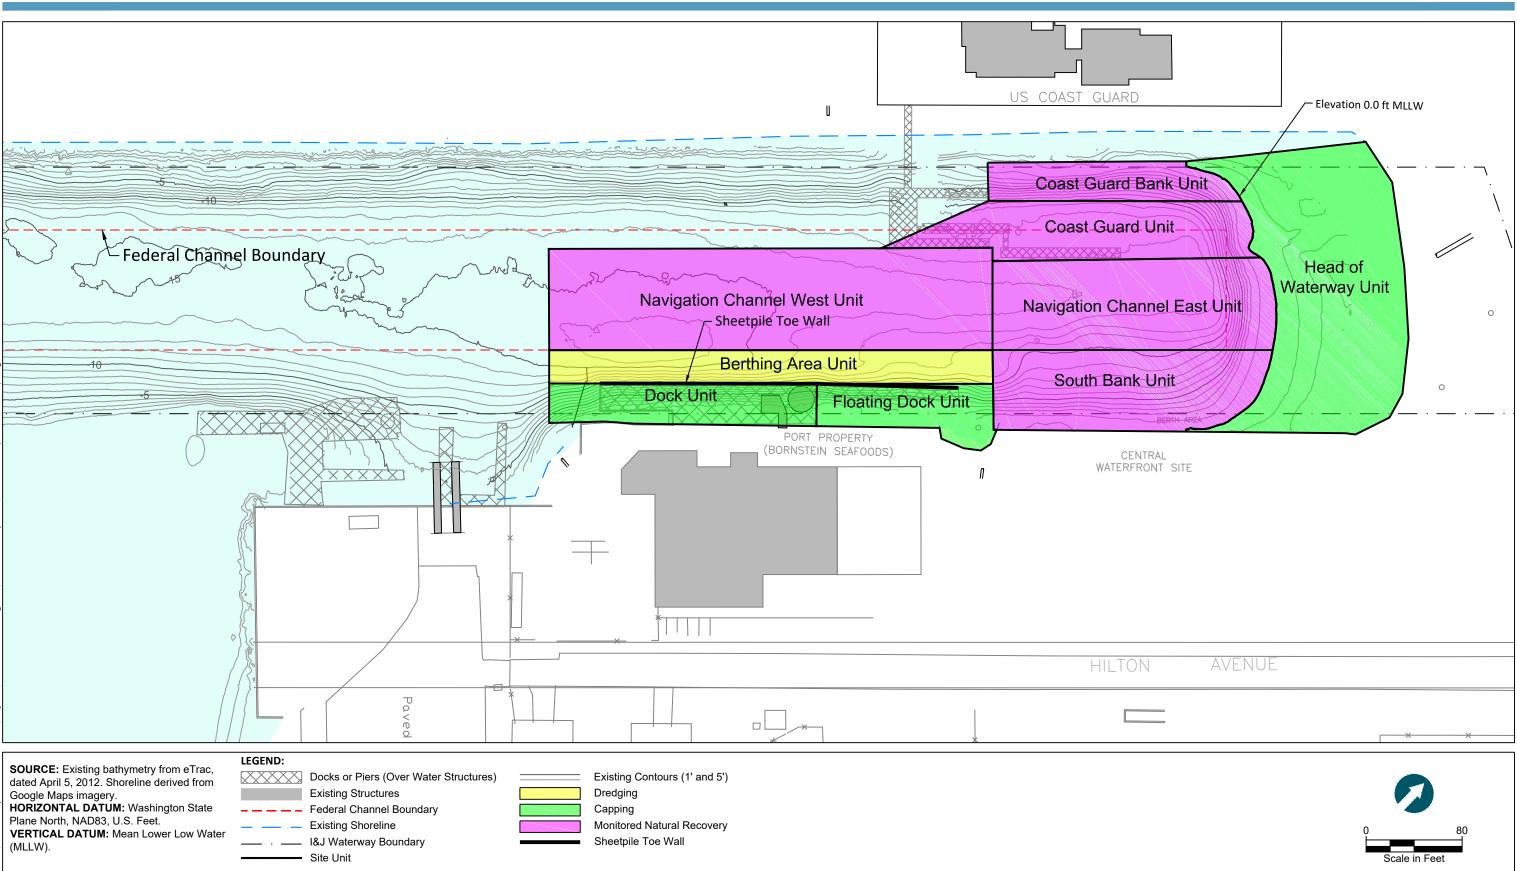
Alternative 1 Cleanup Action Plan I&J Waterway Site Port of Bellingham
